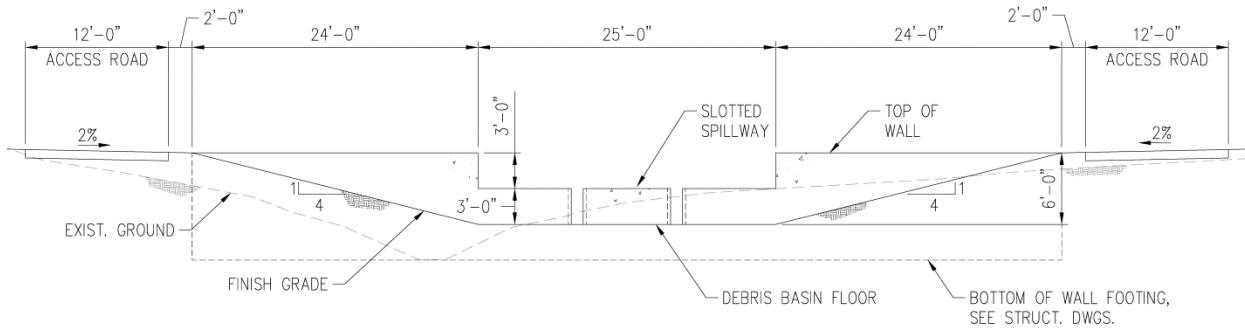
Section View of Debris Basin "A" Looking Downstream
